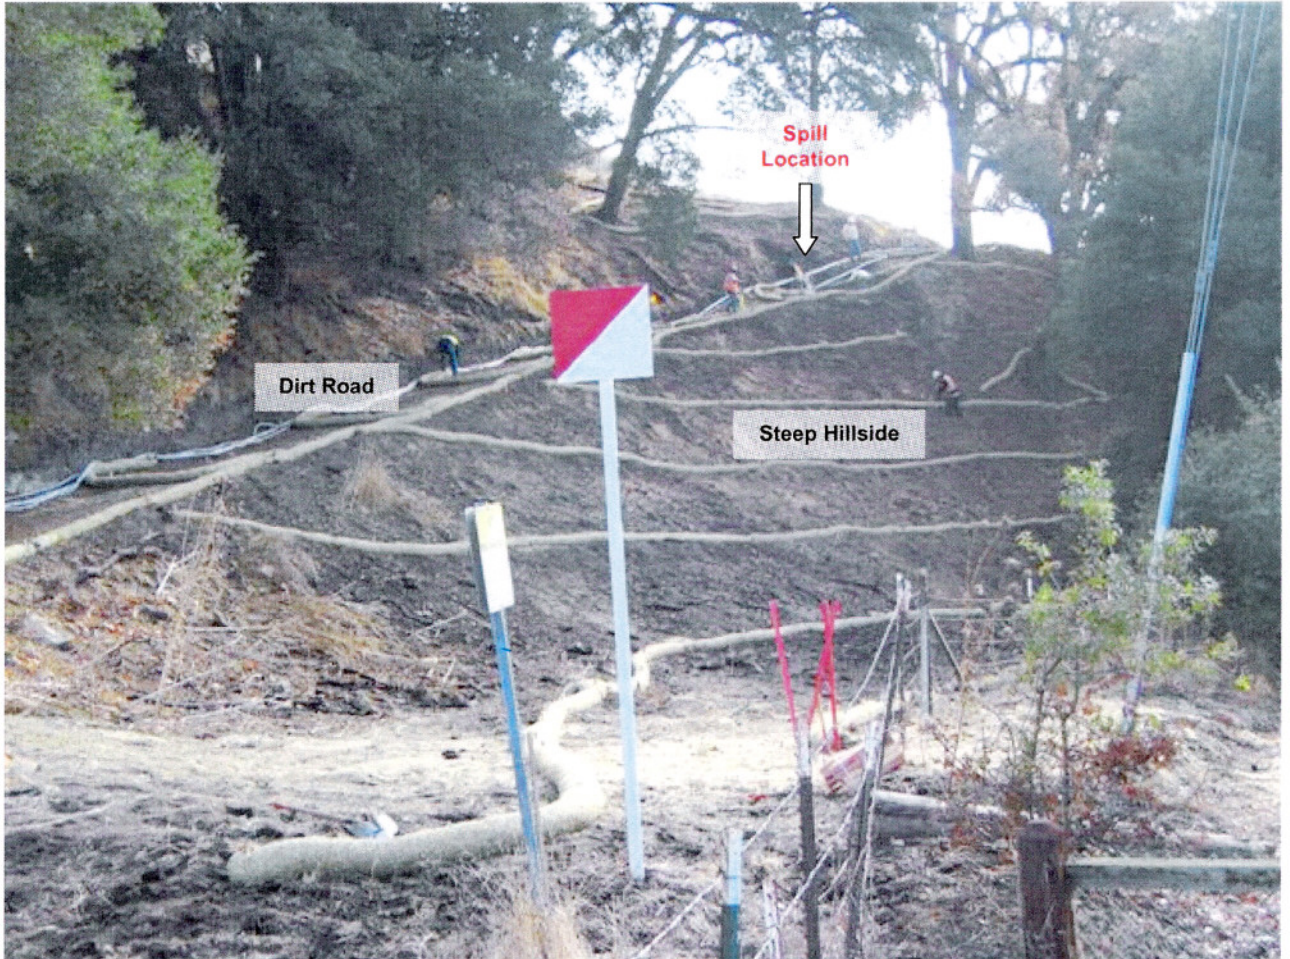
Steep 84-percent slope immediately below the pipeline release location, looking south and down slope towards Calaveras Road, August 25, 2005.
